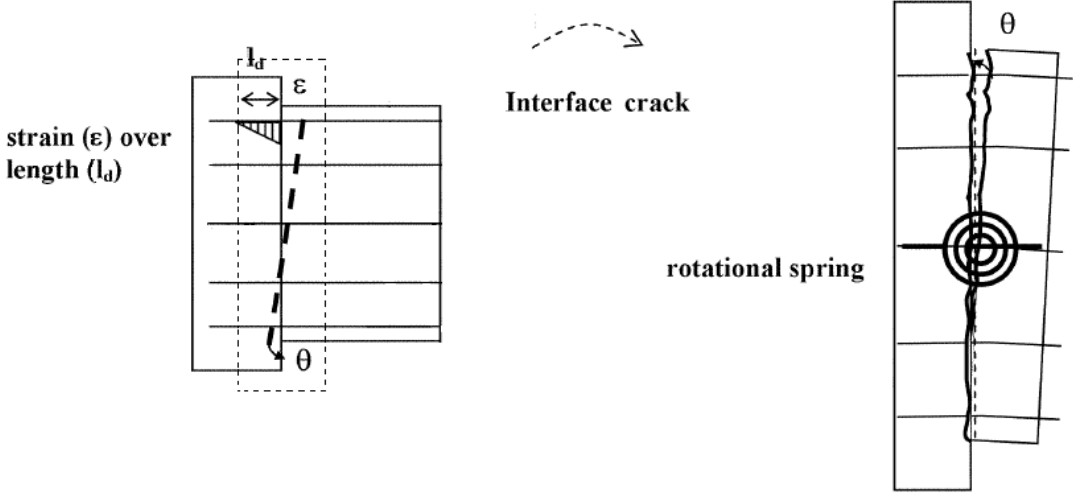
Reinforcing bar extension and interface cracking.
